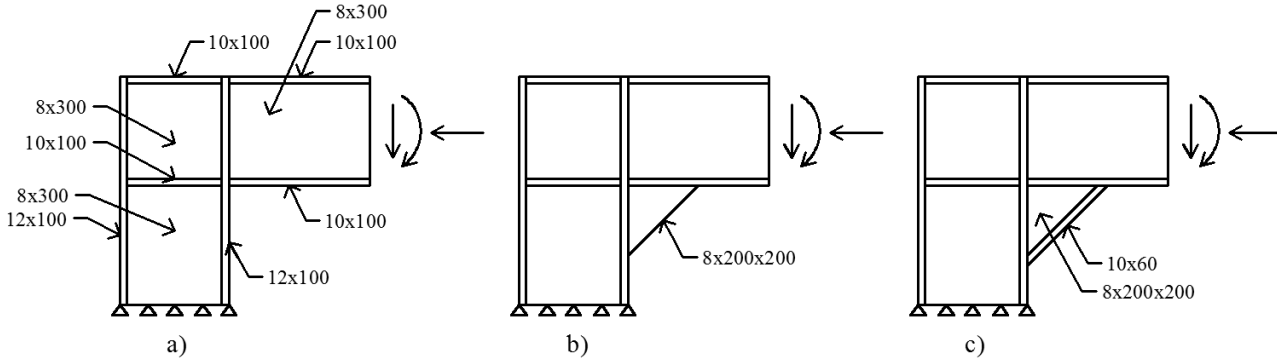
a) Beam-to-column joint without stiffener; b) Beam-to-column joint with gusset; c) Beam-to-column joint with haunch
